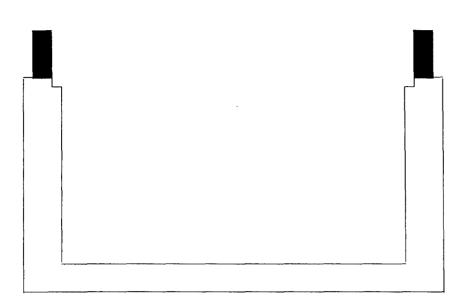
Front view reservoir (blue new, stone masonry wall)
